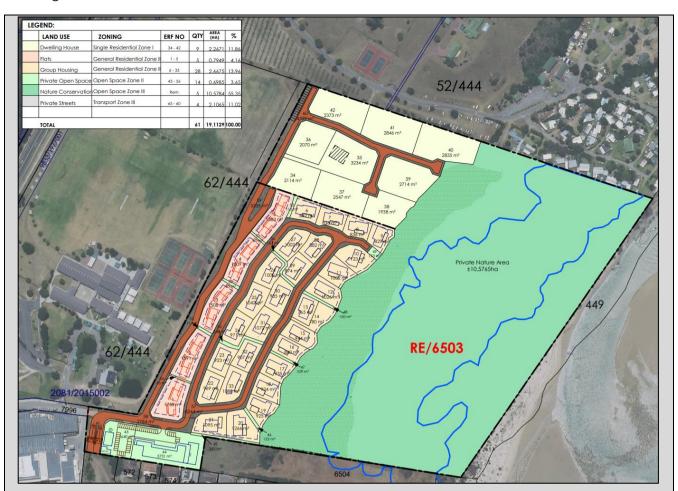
Site layout plan distributed as the preferred alternative in the Pre-Application Draft Basic Assessment Report.
